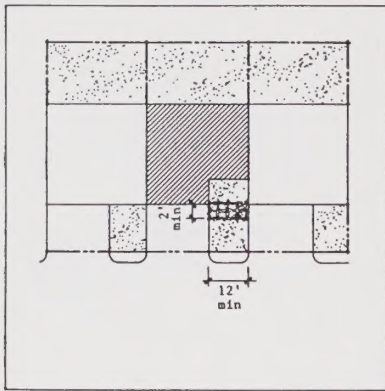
B.2-1. Trellis at entry and second floor living space over garage.
